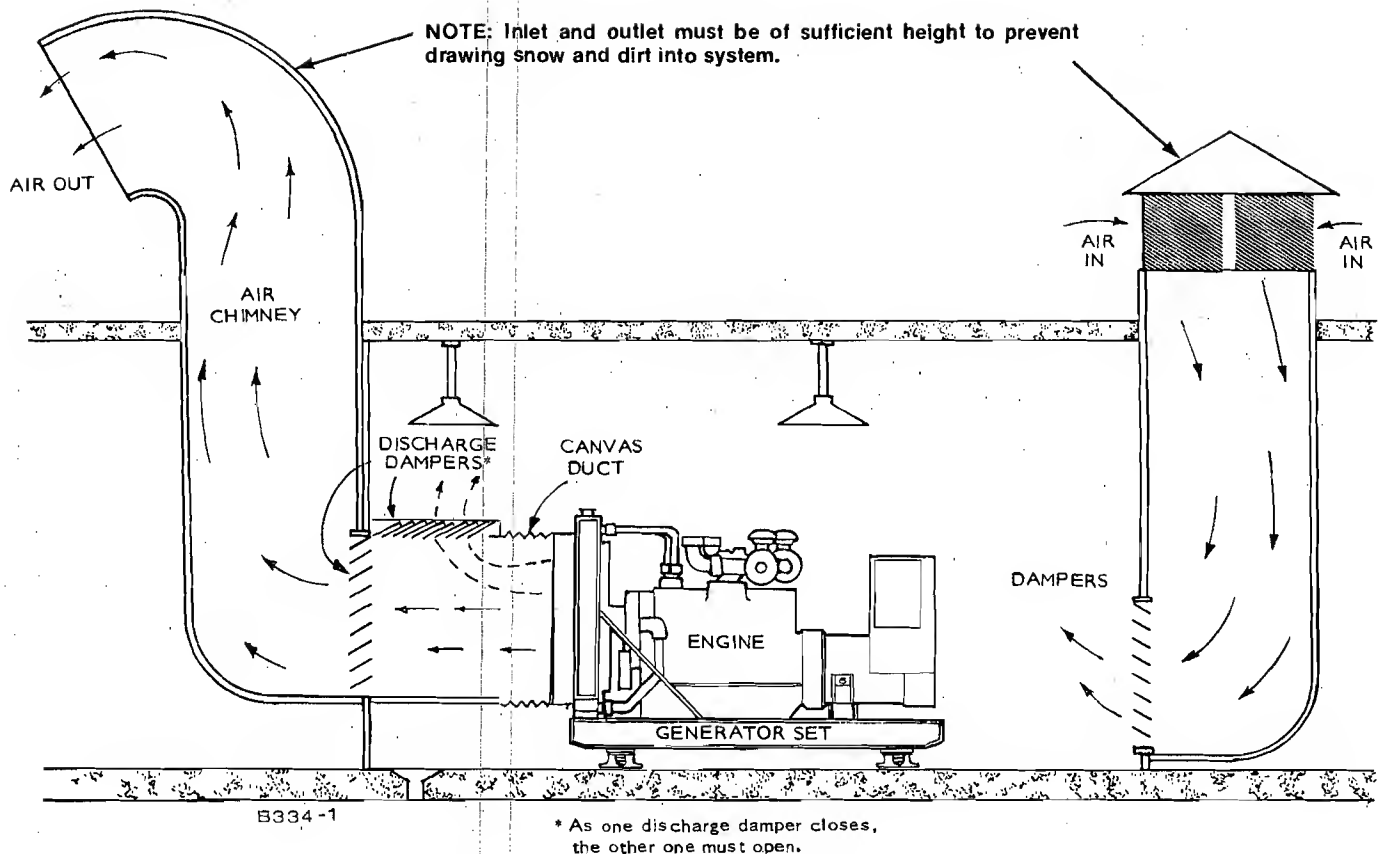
TYPICAL DUCT INSTALLATION WITH ROOFTOP AIR INLET AND OUTLET AND DAMPERS FOR AIRFLOW
